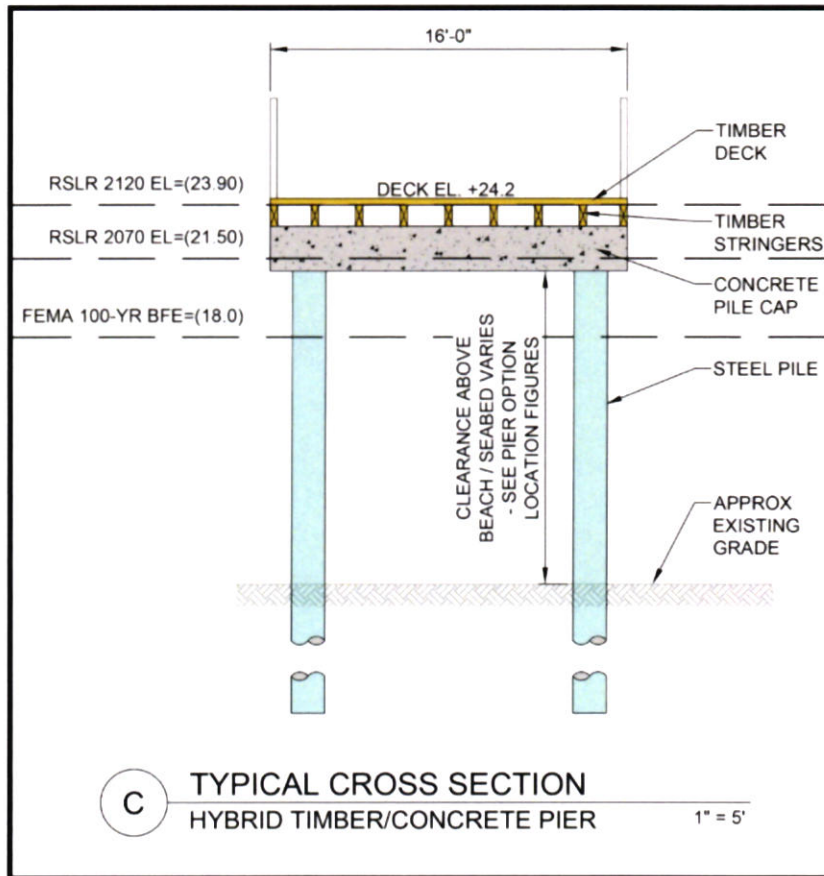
Proposed Hybrid Precast Concrete & Timber Pier Conceptual Cross Section
